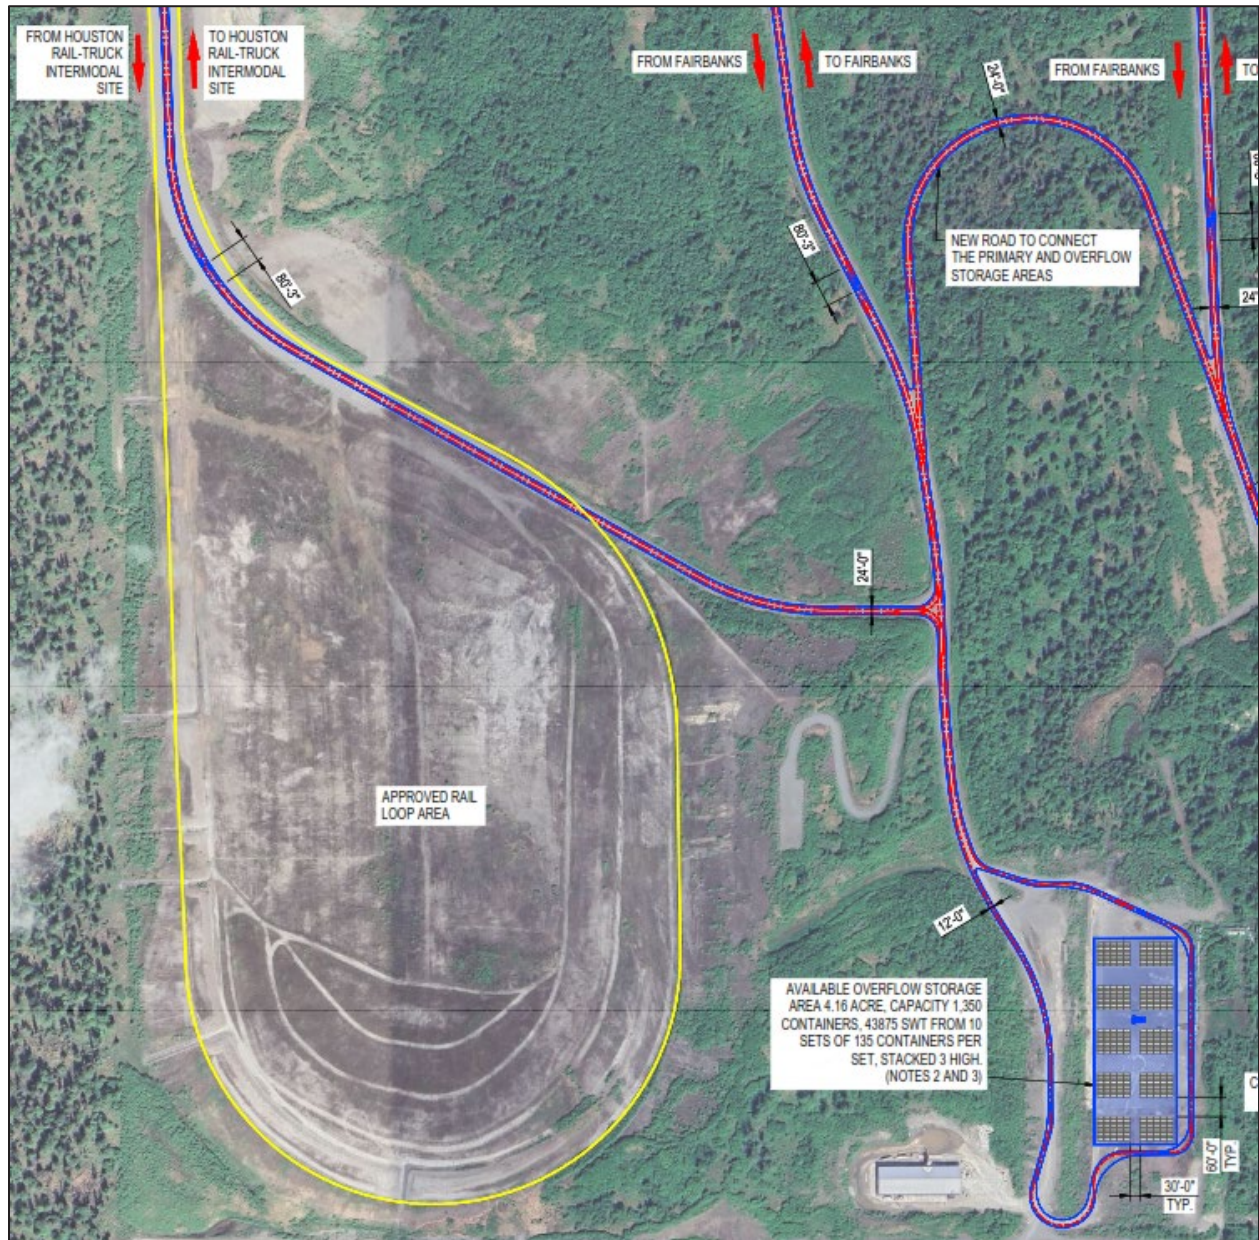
Port MacKenzie Proposed Site Plan: Rail Loop, Access Roads, and Overflow Storage Area Detail
